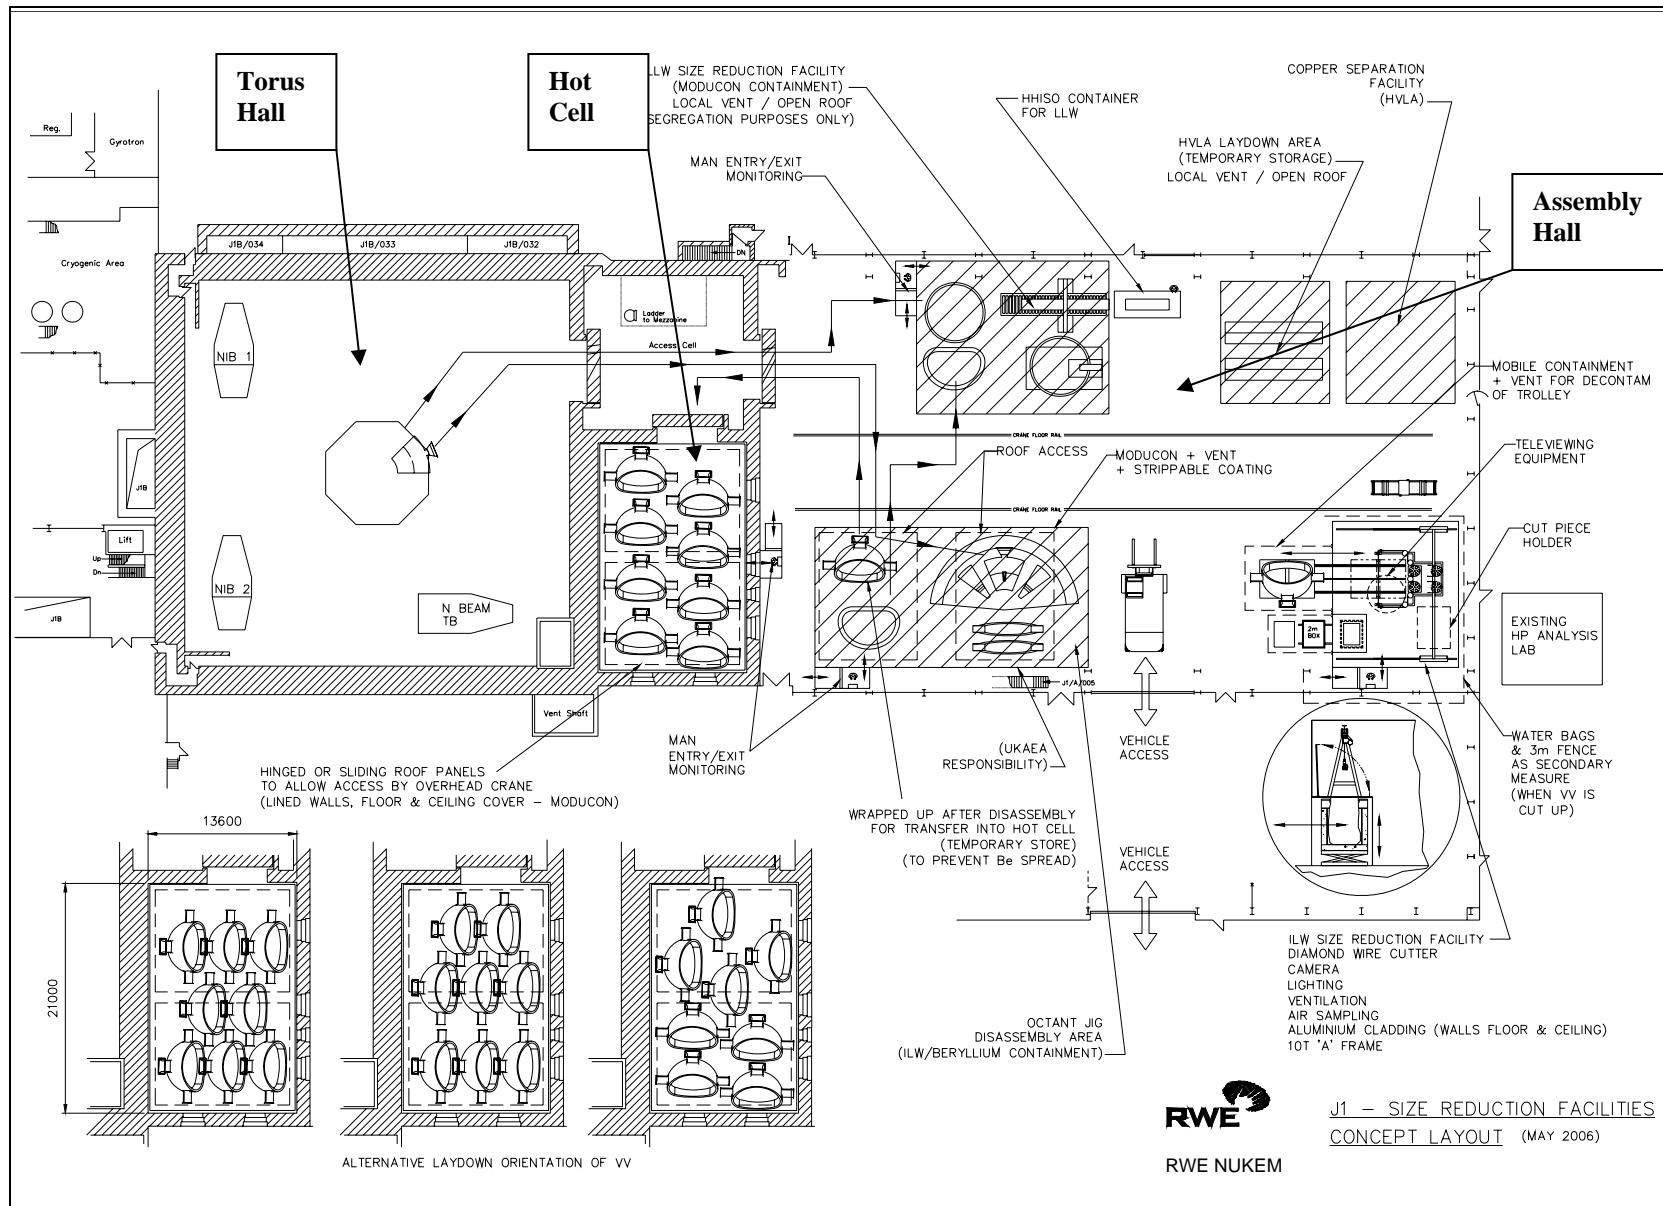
Layout of the size reduction and packaging facilities within the Assembly Hall
